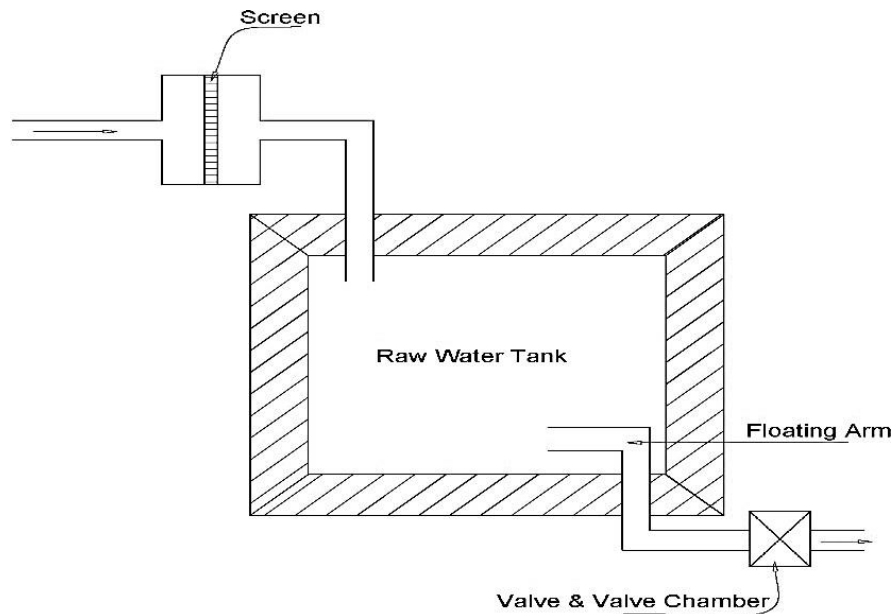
Typical Piping Arrangement in Raw Water Reservoir
